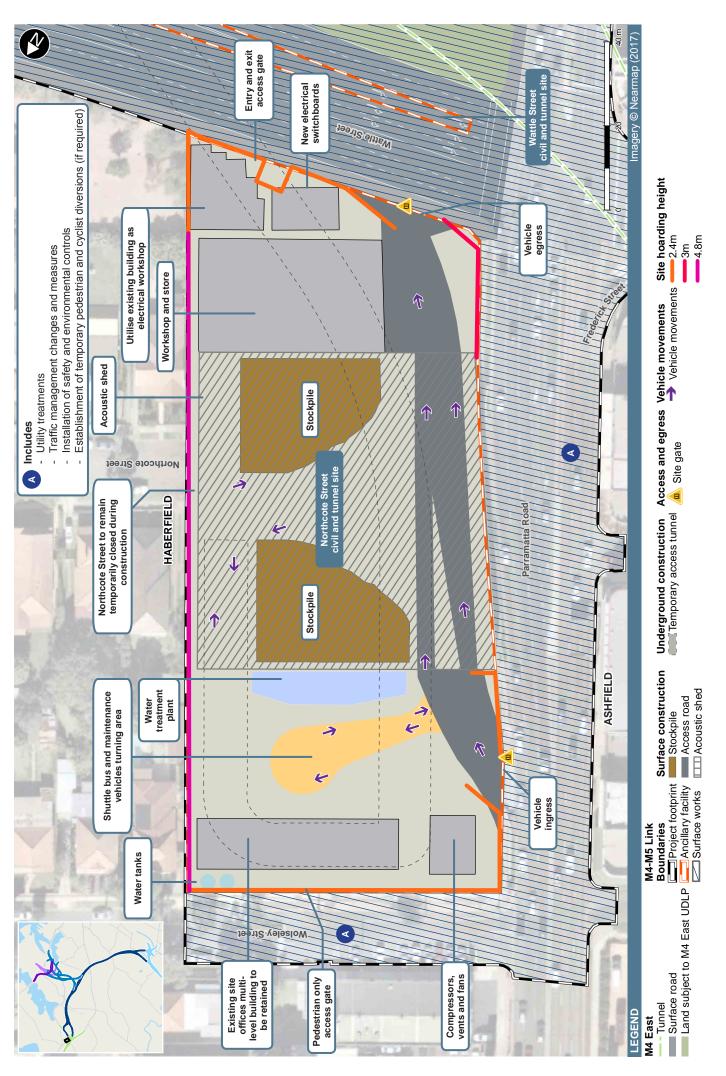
Indicative Northcote Street civil and tunnel site hoarding height
